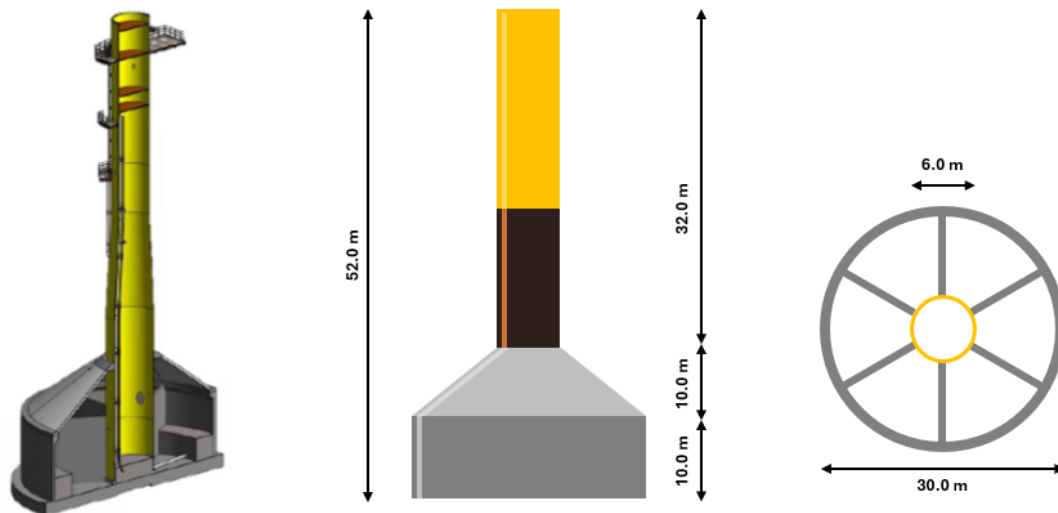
Sectional view and main dimensions of the BOD GBF design [54].
